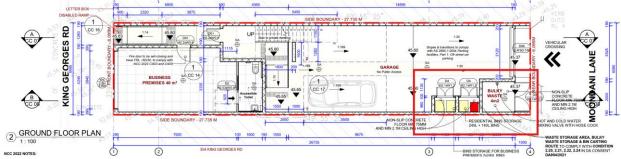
Ground floor - 352 King Georges Rd, Beverly Hills
